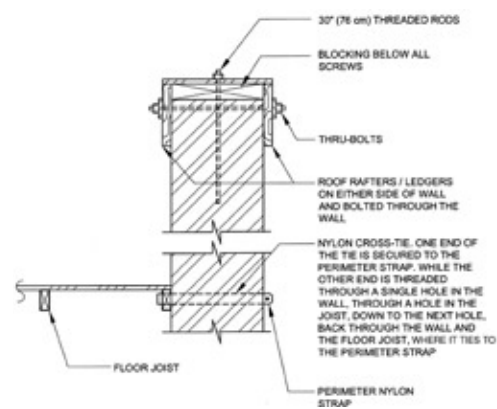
For models 7 and 9, connection between walls and diaphragms at non-load-bearing walls. Note that dimensions are prototype dimensions.
